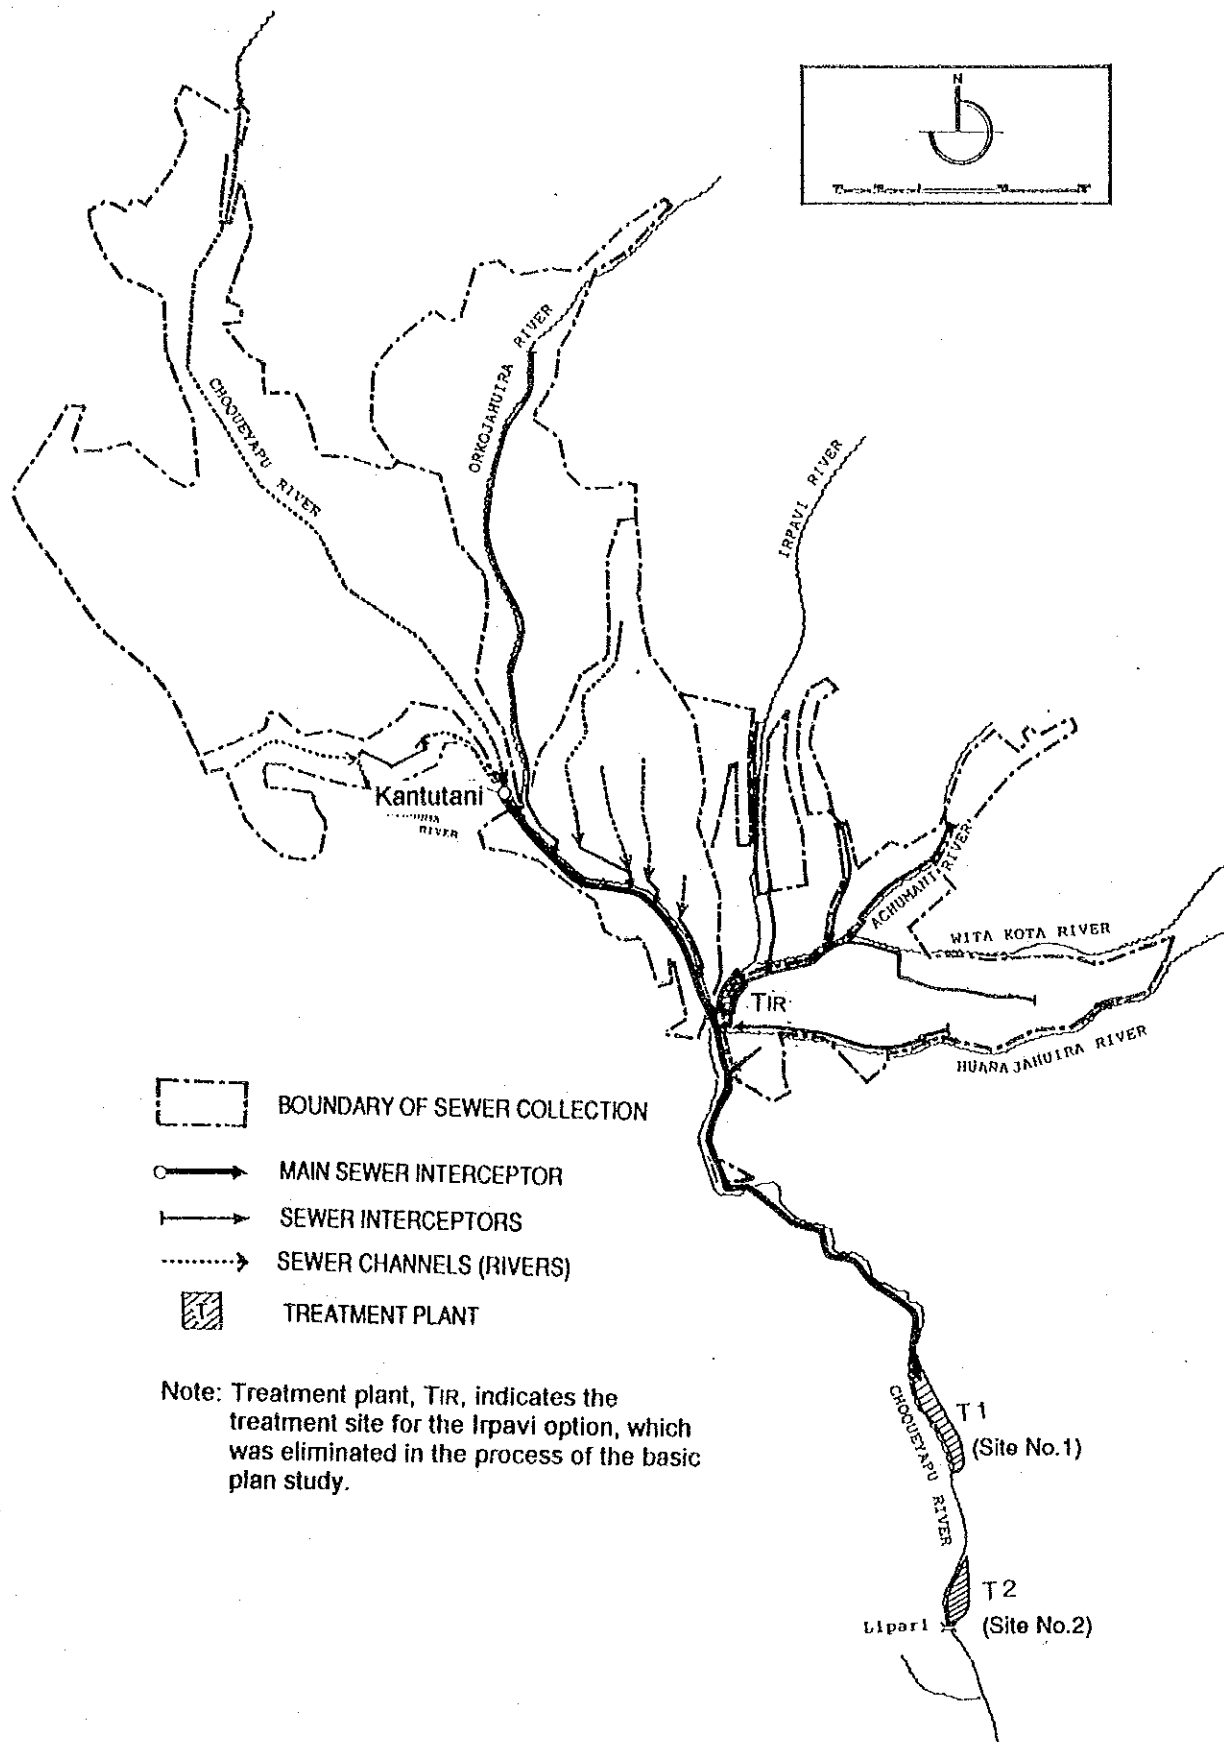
General Layout of the Facilities in the Basic Plan
